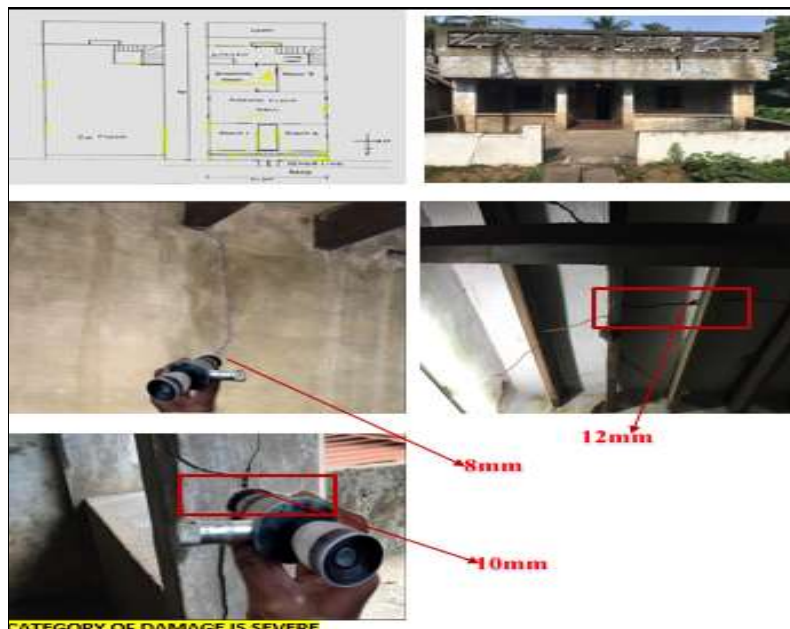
Cracks in walls, ceiling, pillar of the case study in location L1
